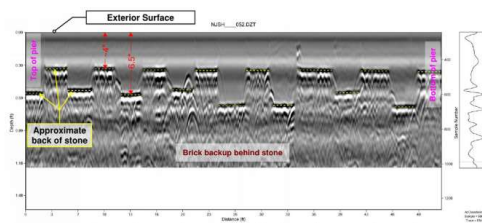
Representative vertical SPB scan taken at an exterior wall on the west elevation. Here, the stones alternate in thickness very regularly, which should not be considered the typical condition.
